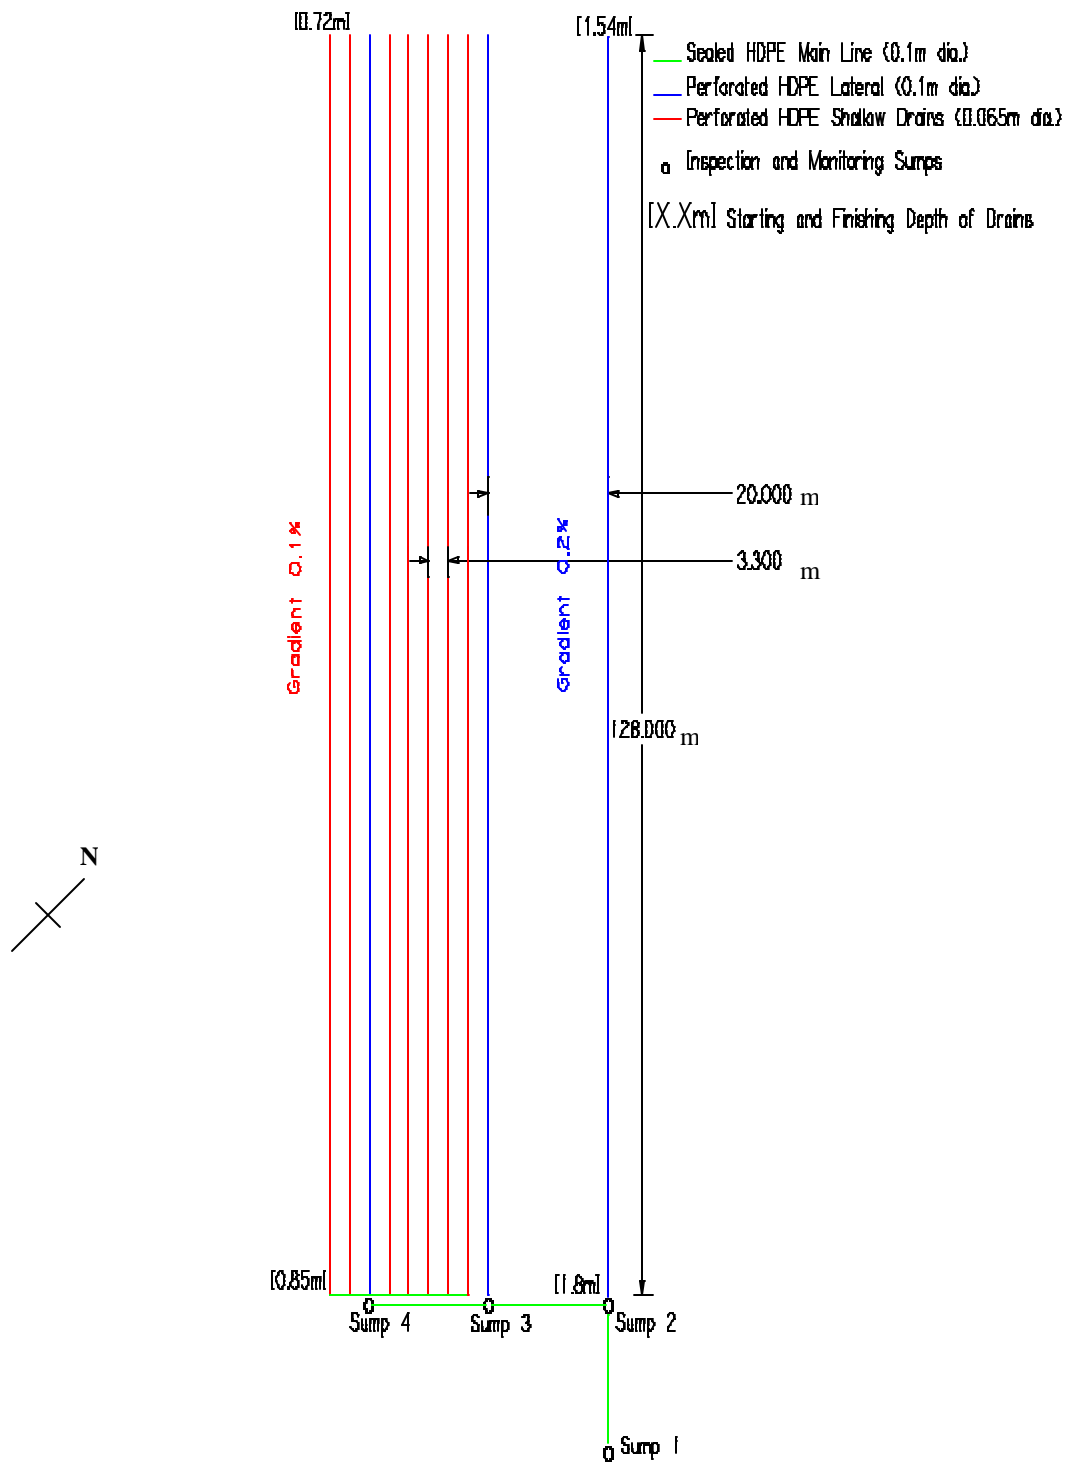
Plan view of subsurface drainage system installed at the MLD site.
